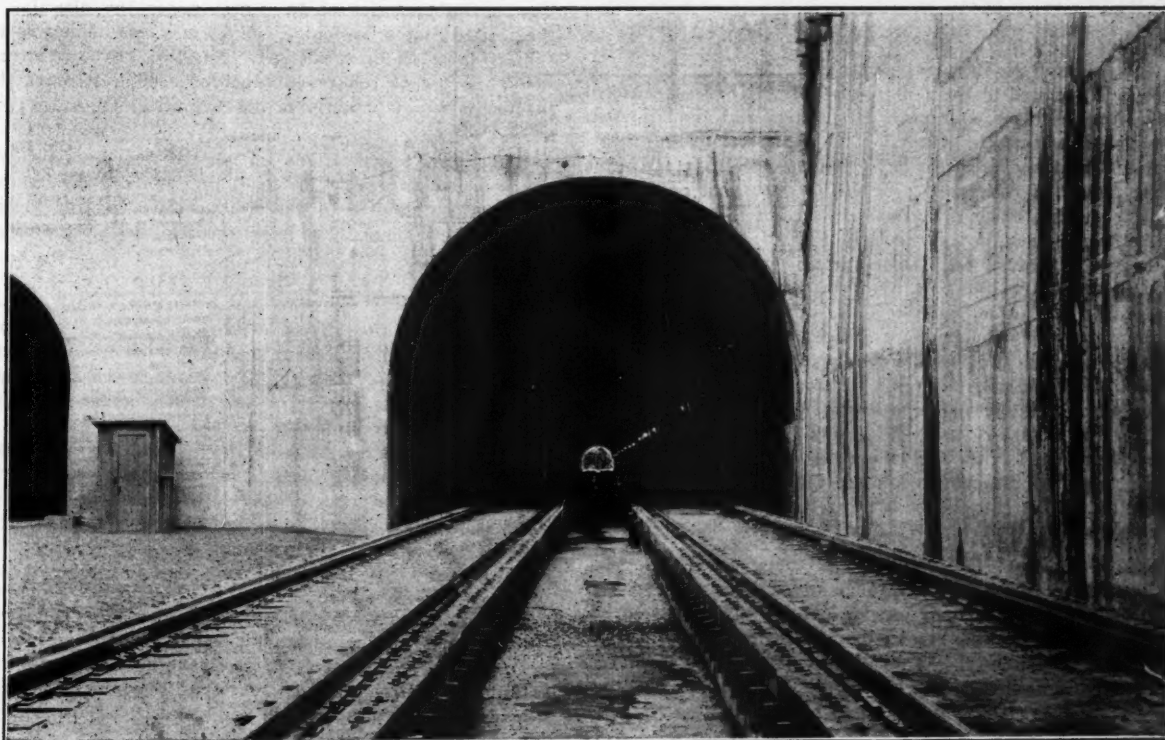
Concrete Roadbed Construction in Bergen Hill Tunnel, D. L. & W. R. R.
